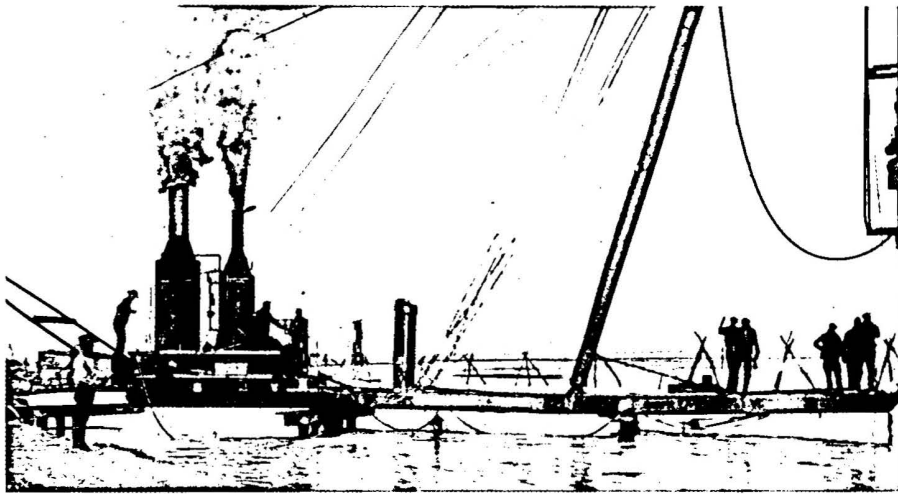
Driving Piling During Construction of a Treated Timber Bridge Over the Rio Grande at Bernardo in 1931. (*N.M. Highway Journal*, September 1931, p. 29)
